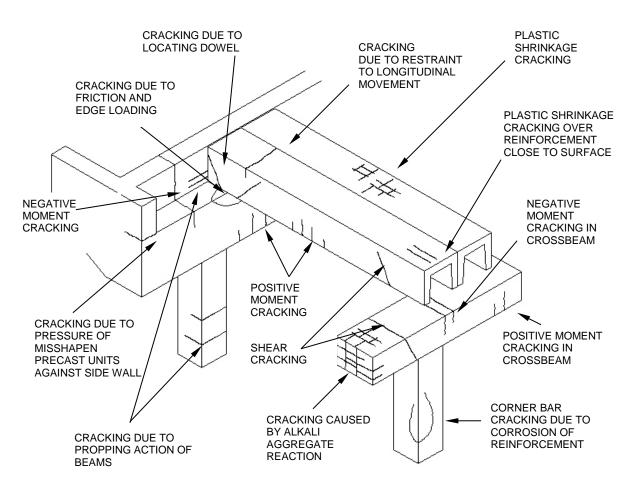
A - CRACKING IN CONCRETE BRIDGE STRUCTURES
